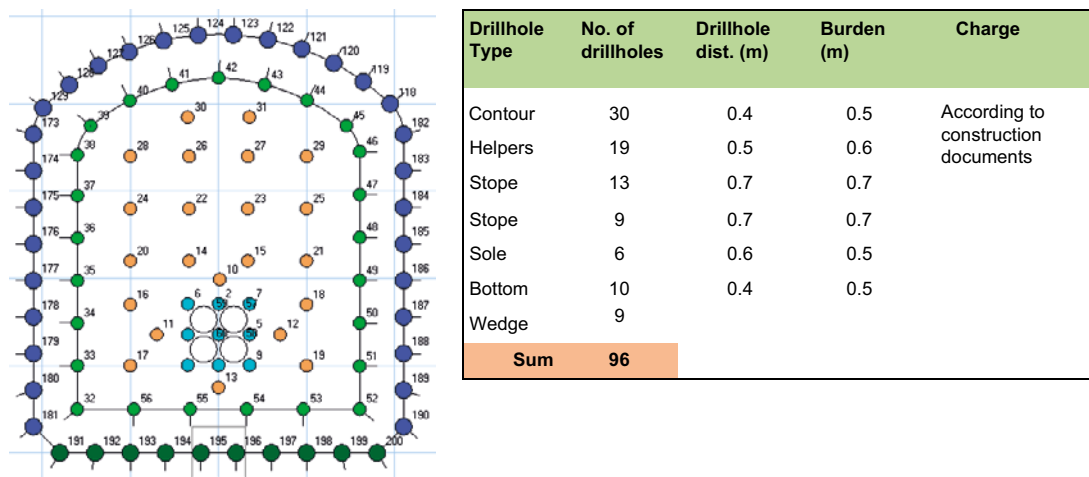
Drill and charge plan for DOMPLU test tunnel TAS01.
